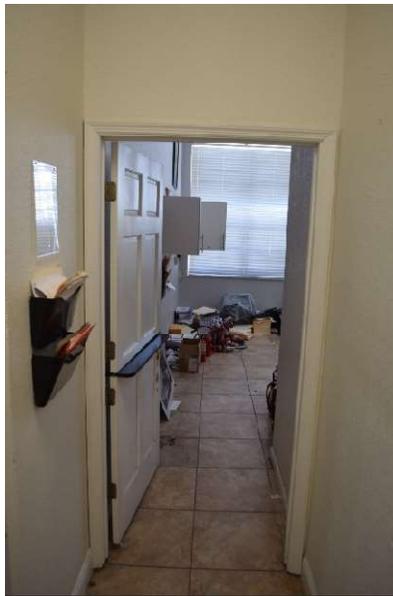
Detail of door opening at west end of alcove, August 2022.
